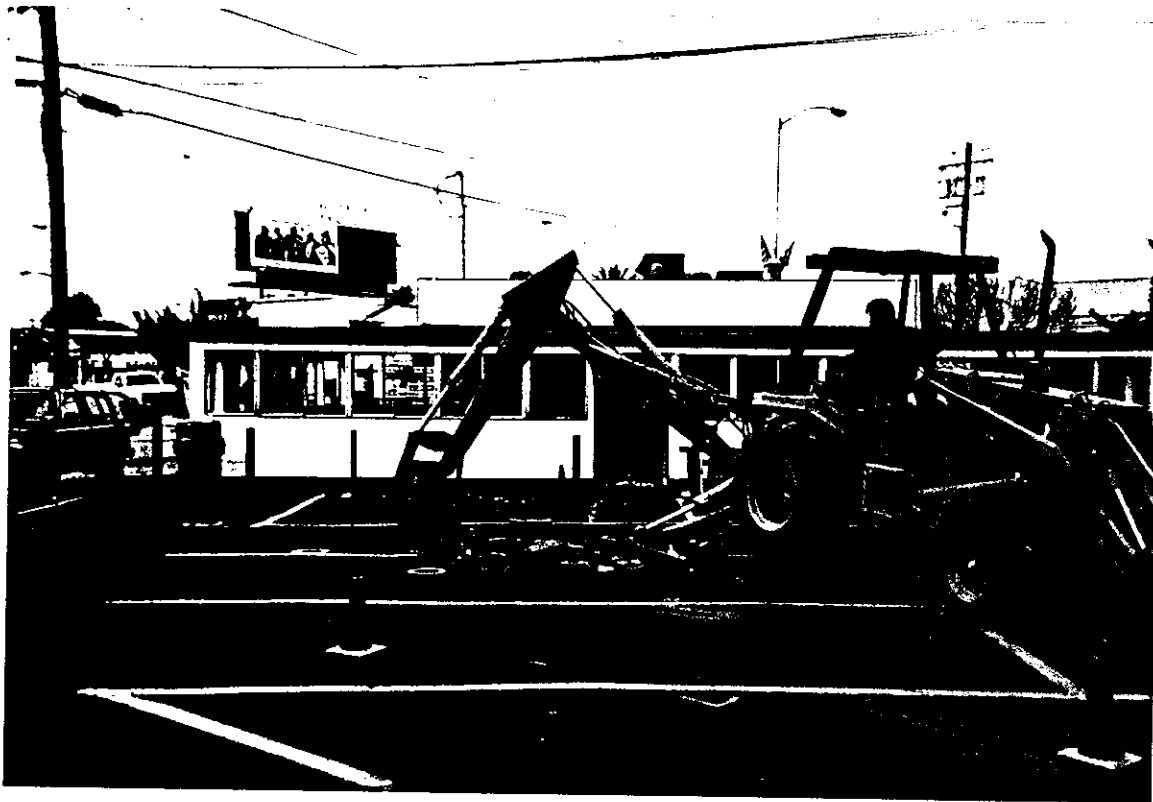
Duffy Diner's parking lot. Breaking asphalt of UST location.
